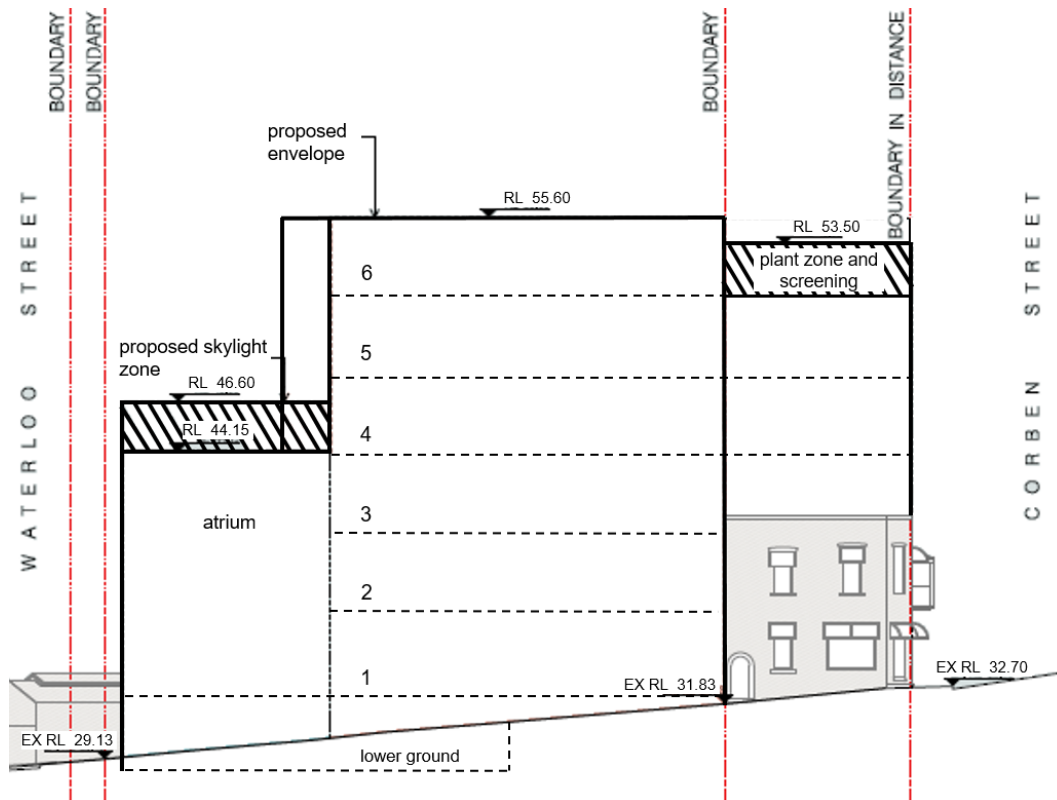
Foveaux Street elevation of the proposed building envelope for future development at 72-84 Foveaux Street, Surry Hills.
